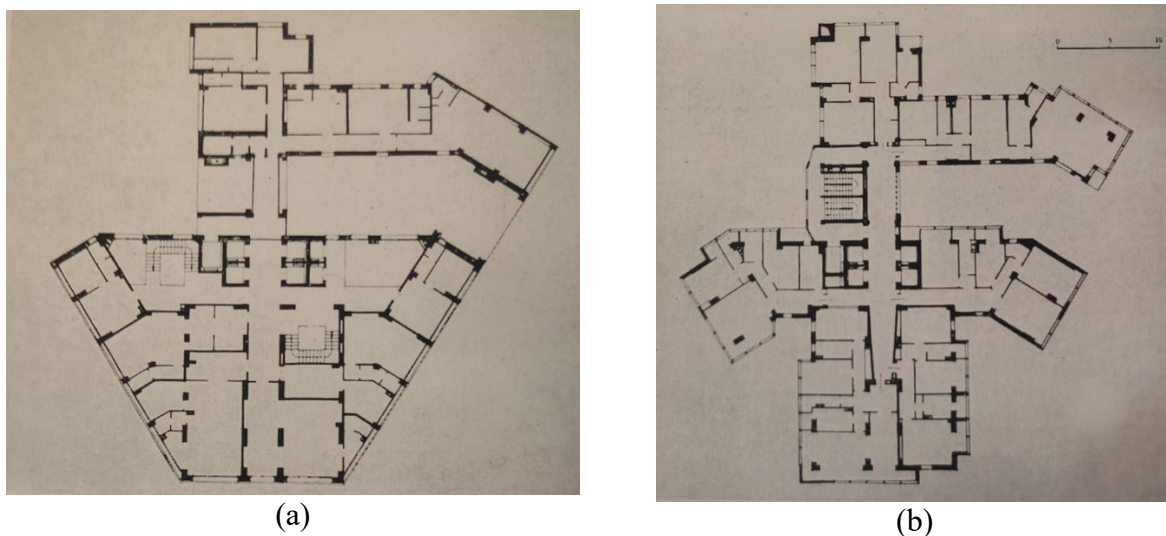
First Floor Plan (left) and Floor Plan for Levels 8 to 11 (right). Extracted from the online documents of the Giovanni Michelucci Foundation (<http://db.michelucci.it/archivi/progetti/?opera=P125>).
